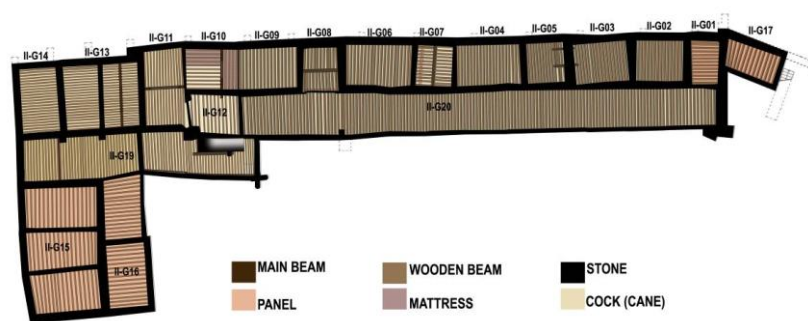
Survey drawing of the north wing building, ceiling plan of the ground floor
